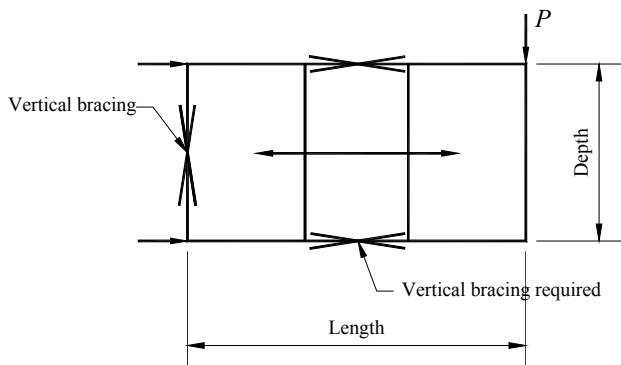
Cantilevered diaphragm: sheeting spanning parallel to length of diaphragm
